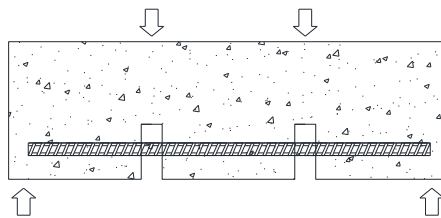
Beam anchorage specimen (ACI 408R-03)
